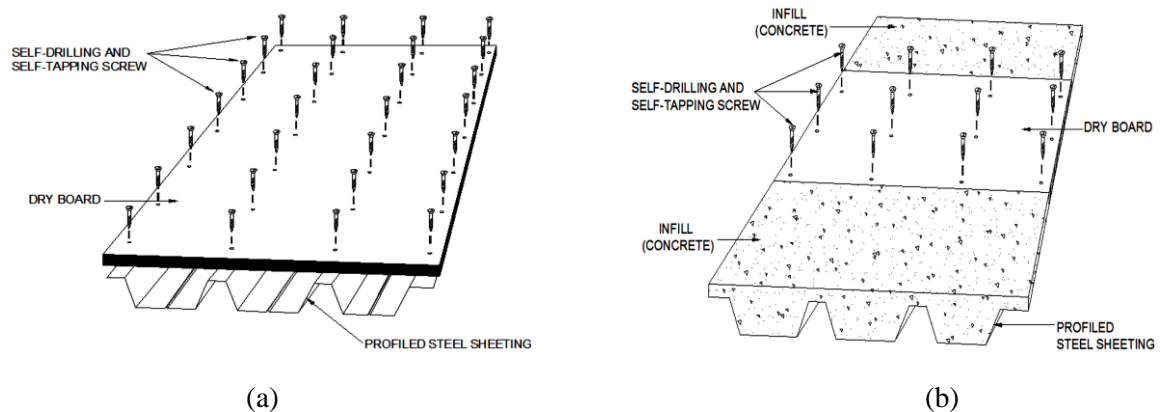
(a) PSSDB basic structural (b) PSSHDB with concrete infill
